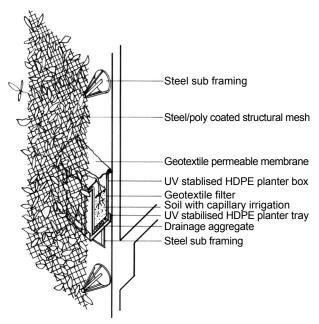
Blanket cover mesh wall planting (Boughouse, 2003)
